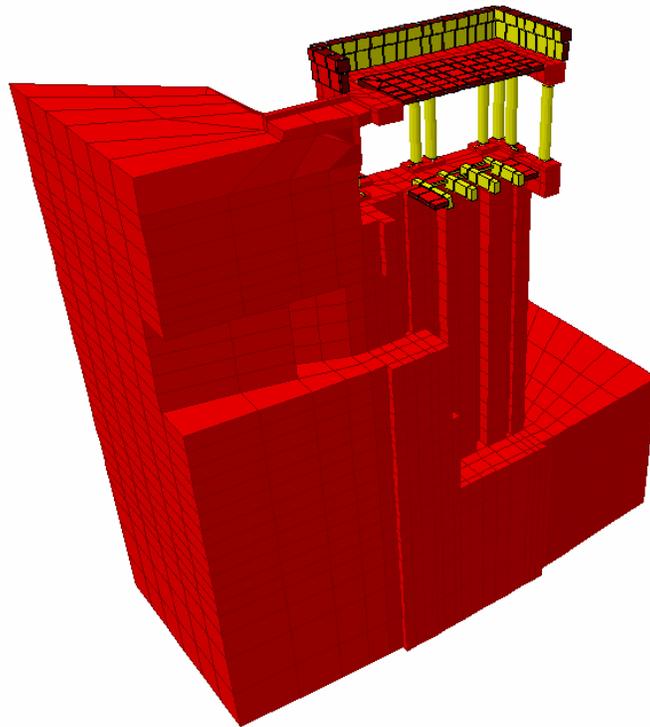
Vertical mid-section view showing stop timber slots and 8' x 10' waste tunnel. Also shown are pavilion roof beams and slab and floor beams and slab.
